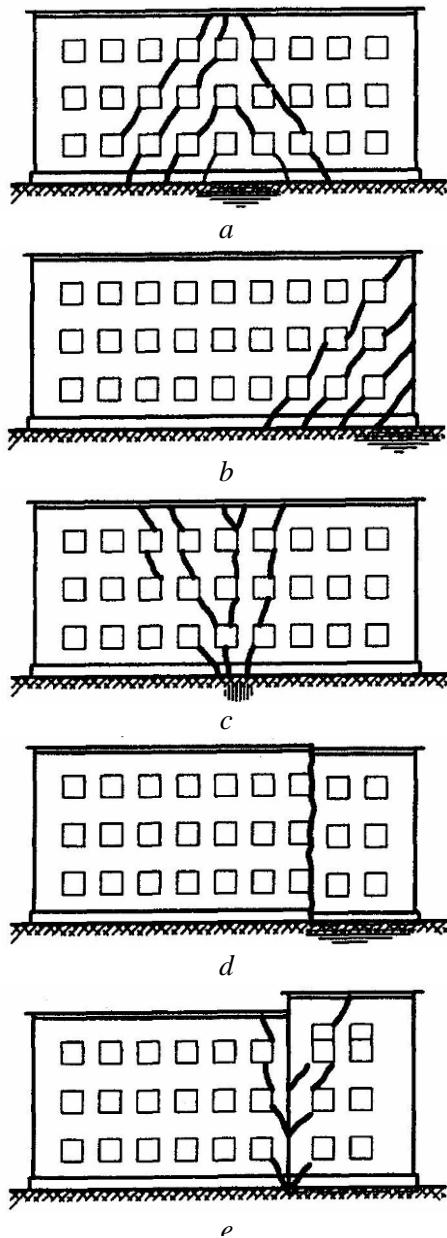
Kinds of cracks allocation in masonry walls and causes of their occurrence: *a* – soil base slackening under the building midsection; *b* – soil base slackening under the shorter side of a building; *c* – hard spot in soil base under the building mid-section; *d* – stepped soil base slackening; *e* – different pressures under attached building blocks
